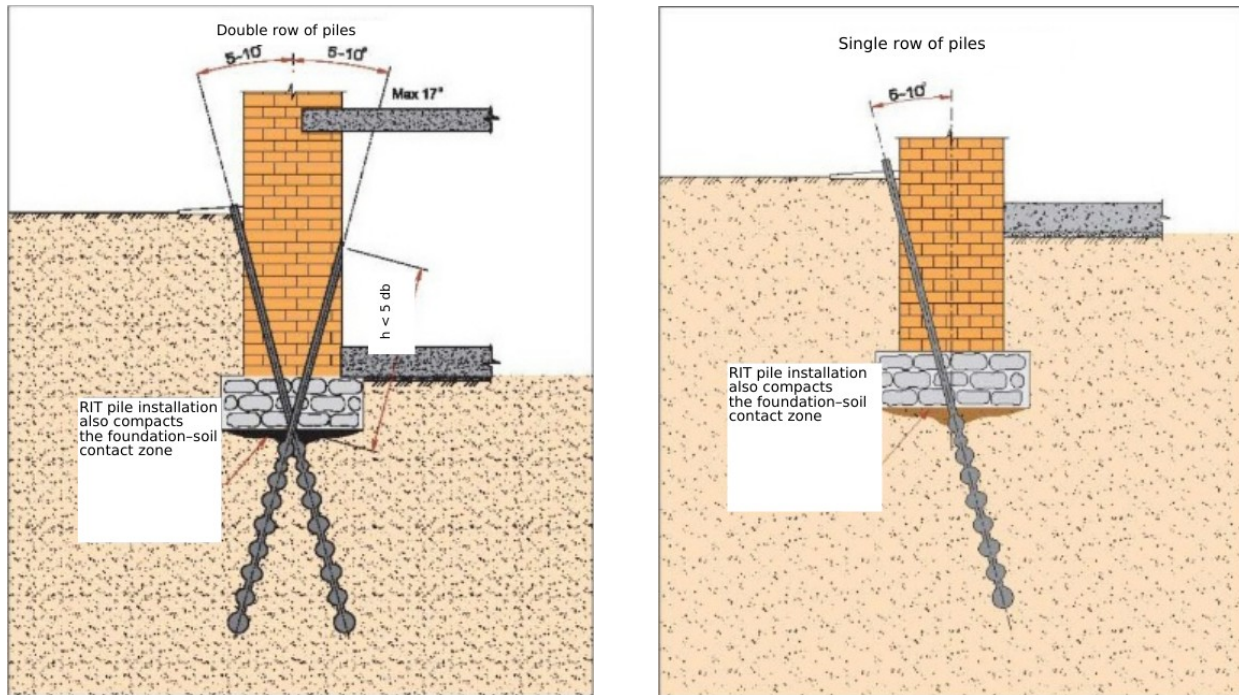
A common arrangement uses paired inclined piles on both sides of the foundation.
